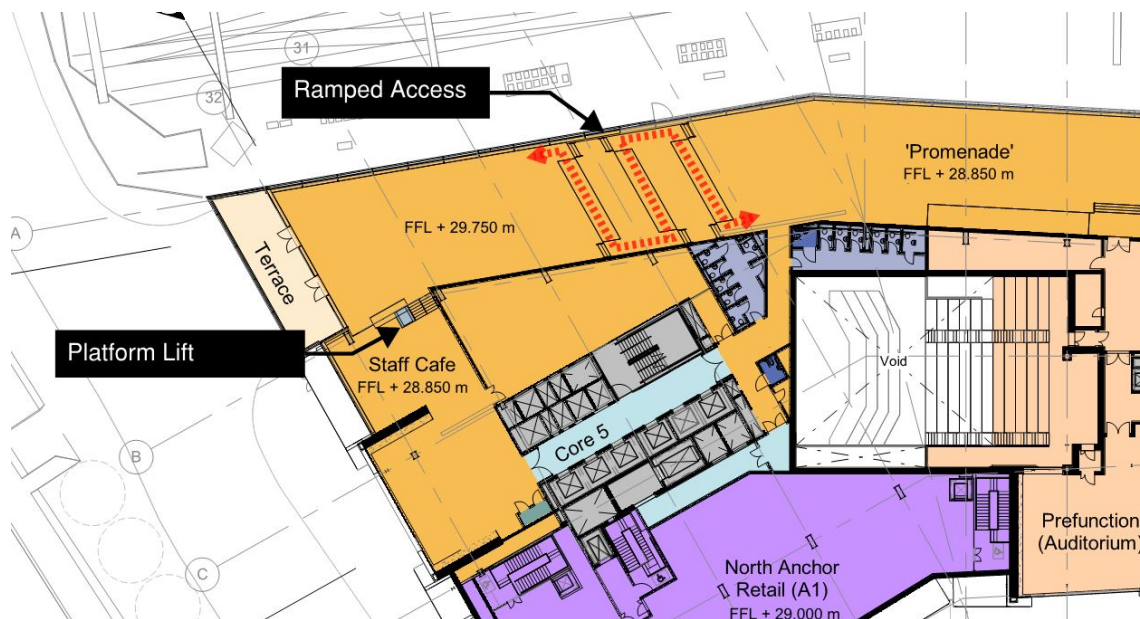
Second Floor Plan showing 'Promenade' Café Ramp and Platform Lift
